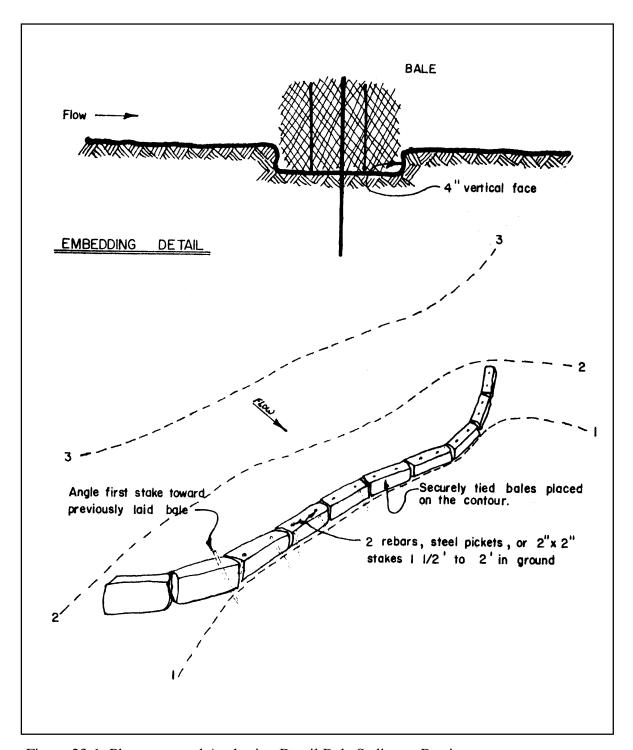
Placement and Anchoring Detail Bale Sediment Barriers
